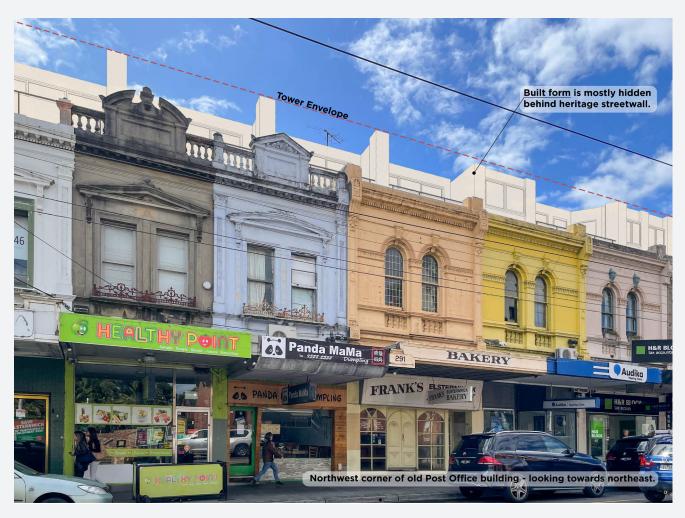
Illustration of maximum building envelopes in the Main Retail Precinct where a five-storey height limit is proposed (for conceptual purposes only).
